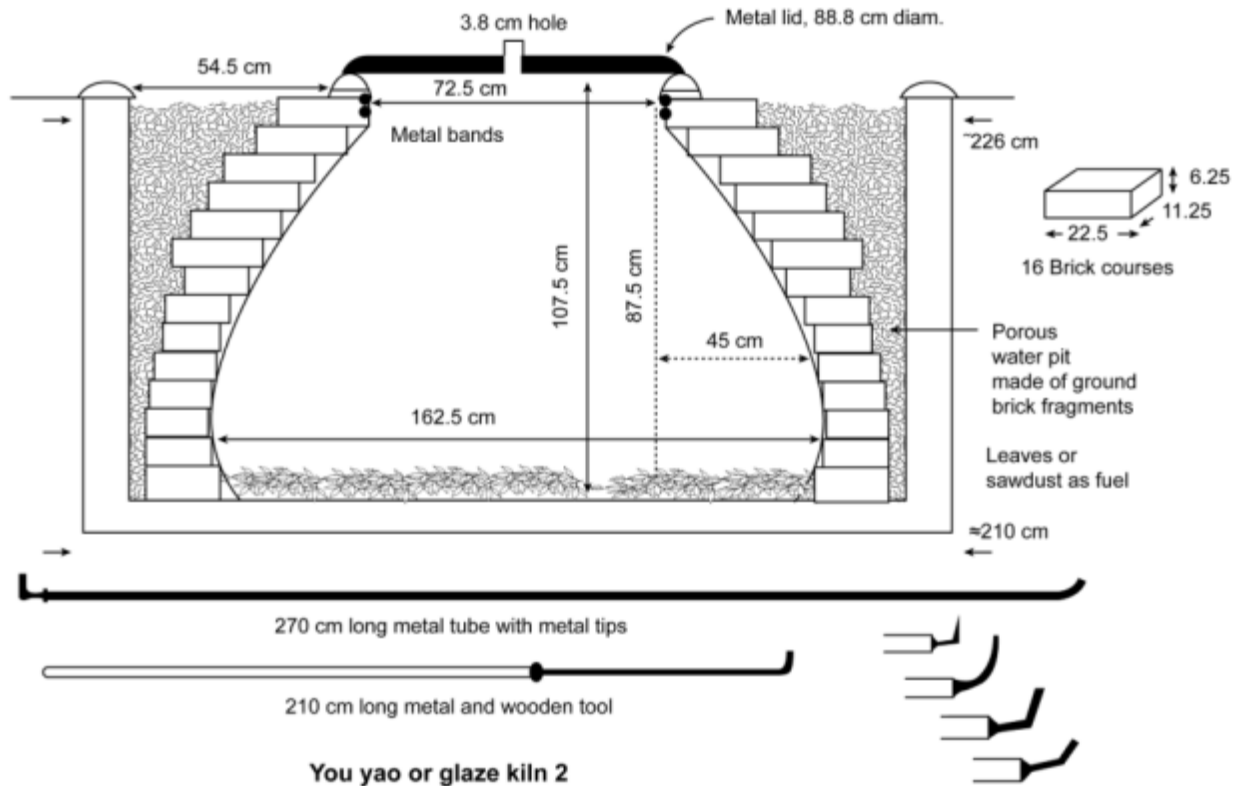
Cross section of the glaze kiln in the Zeng workshop, showing the brick structure of the kiln surrounded by the cooling-water pit.
